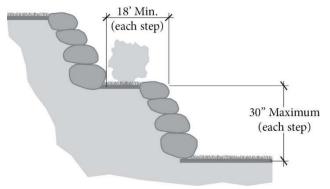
c. Allowable terrace configuration for wall or rockery adjacent to a public sidewalk. Note that this illustration shows a stone wall, but other masonry and concrete walls are acceptable as well.
